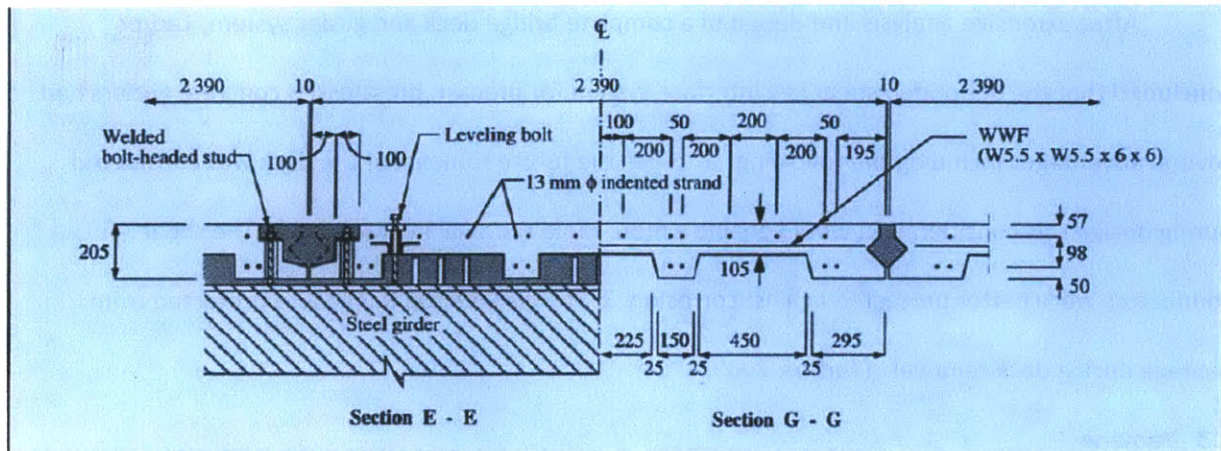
Yamane's Proposed Deck System (Yamane, 1998)
